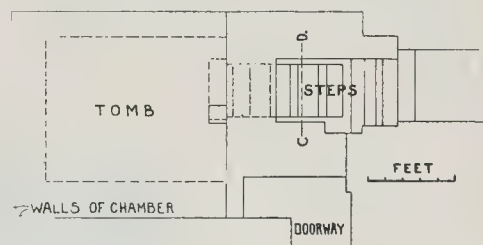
Tomb Constructed in Burnt Brick beneath a Chamber on Outer Walls of Parthian Fortress.
